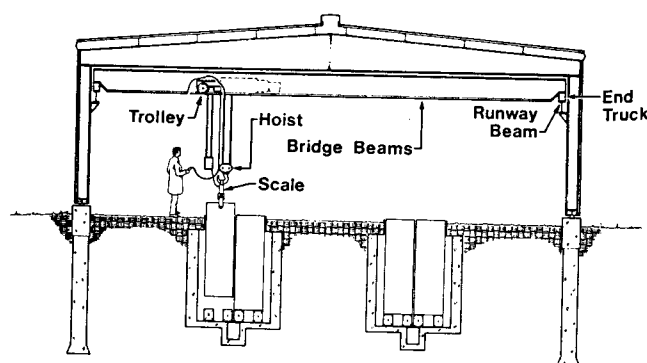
Schematic of double bridge crane, metal building, and lysimeter pits.
